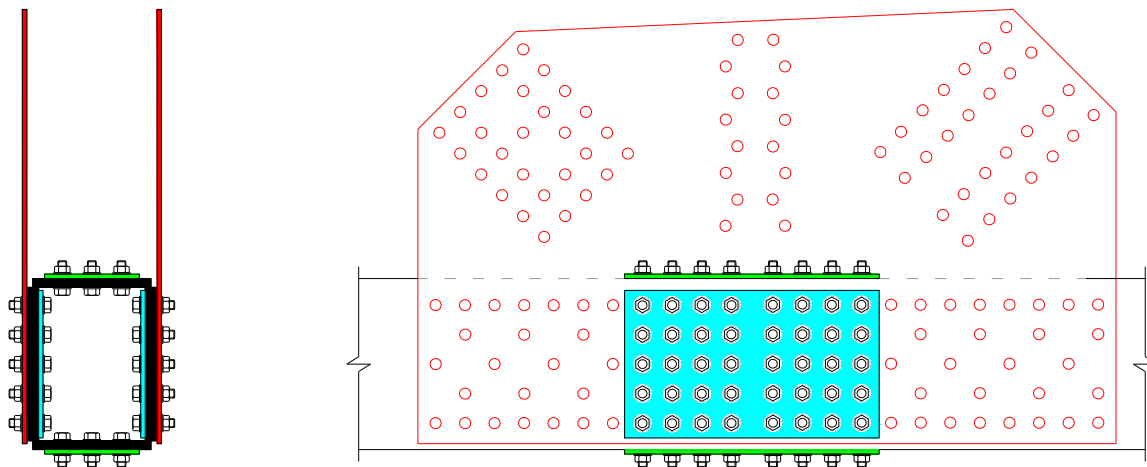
General detailing of chord splice plates. End view (left). Elevation view (right)
